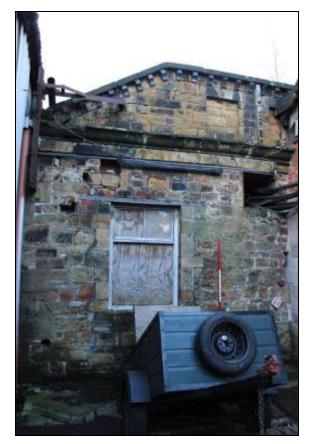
View of a section of the western elevation, showing detailing mirroring that of the eastern elevation and a modified doorway, 2m scale.
